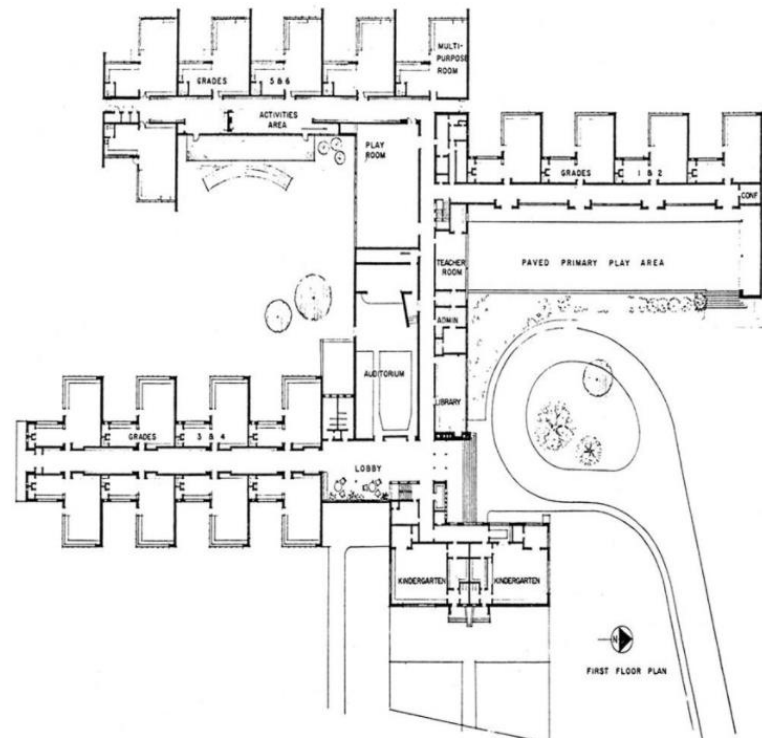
the Crow Island School of Perkins & Will Architects: an early example of a *Finger plan* School [8]
